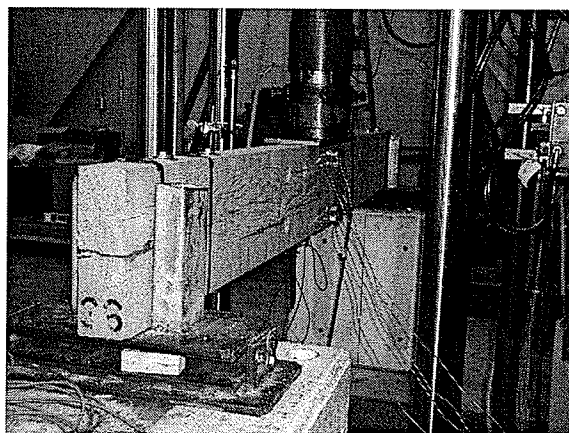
View #2 - 1000 kN MTS Machine Test Setup
